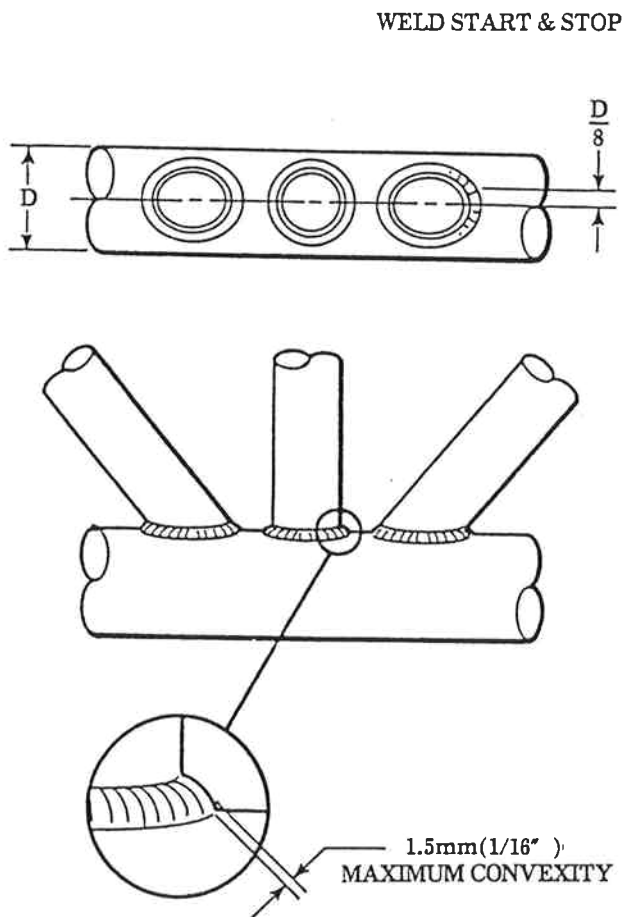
Welding Lacings to Tubular Chord
